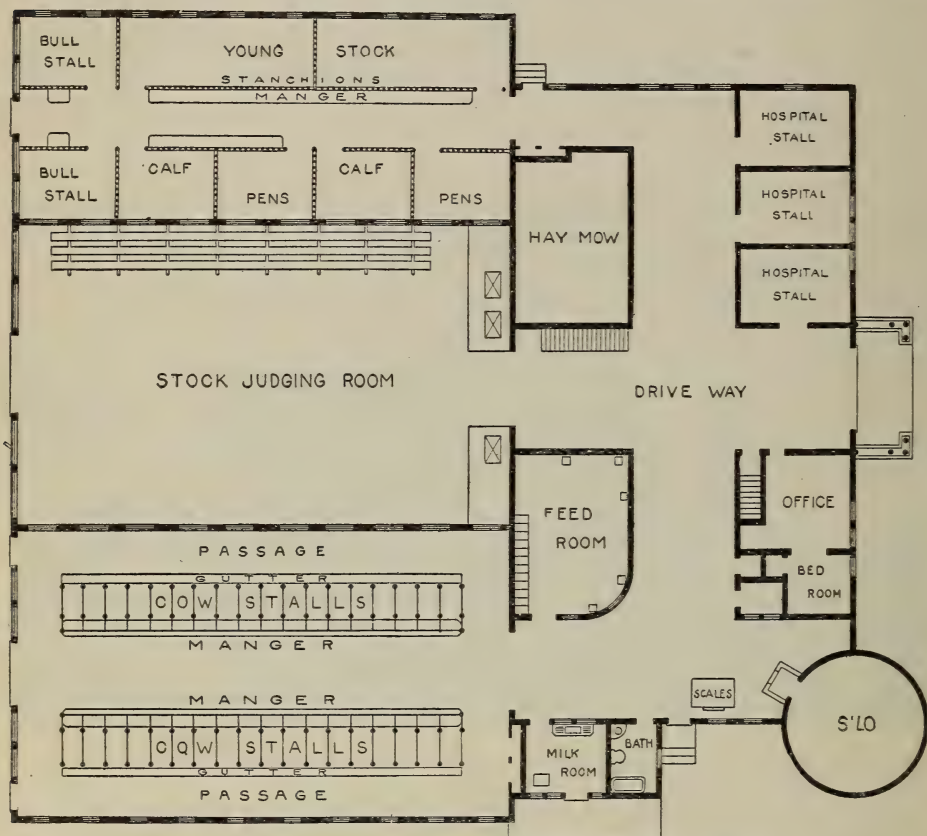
First floor of barn, showing stables, stock-judging room, etc.
